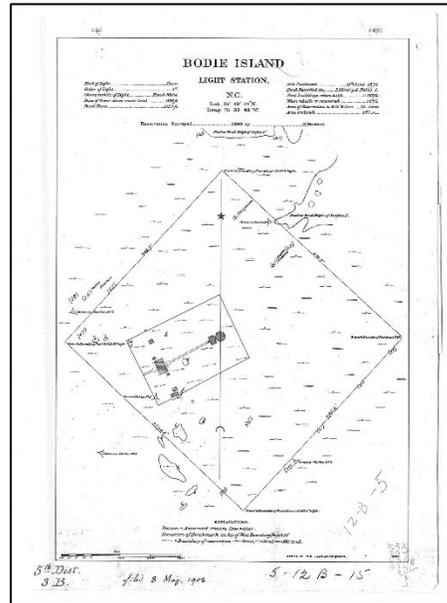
Bamber site plan, 1893. (CAHA Collection)
